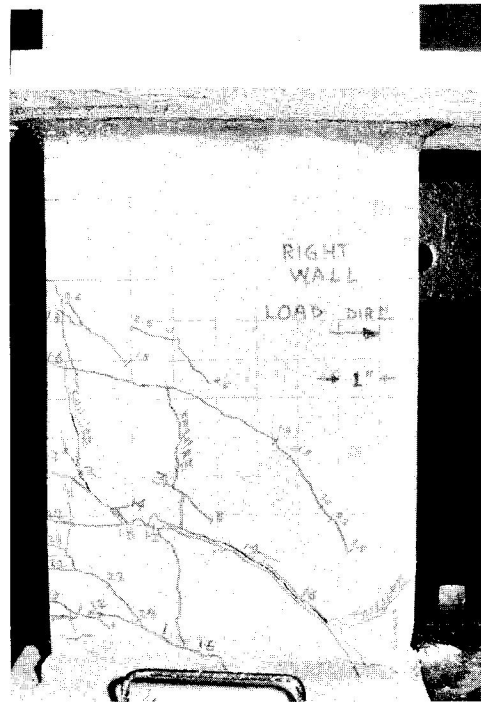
CRACK PATTERN & FAILURE MECHANISM
